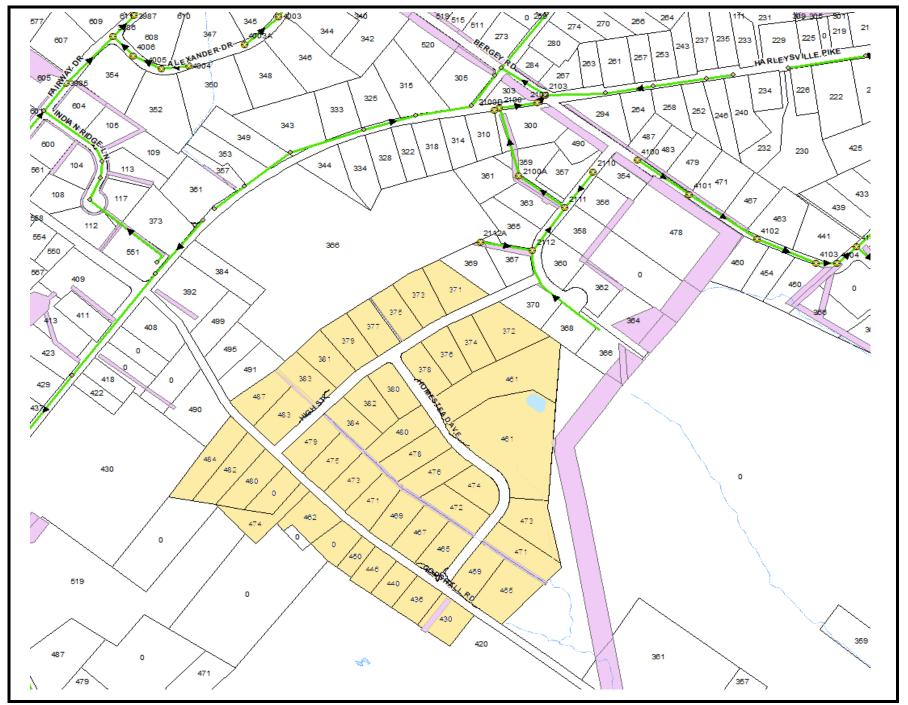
SEWER INFILLING AT HIGH ST. AND HOMESTEAD AVE.
